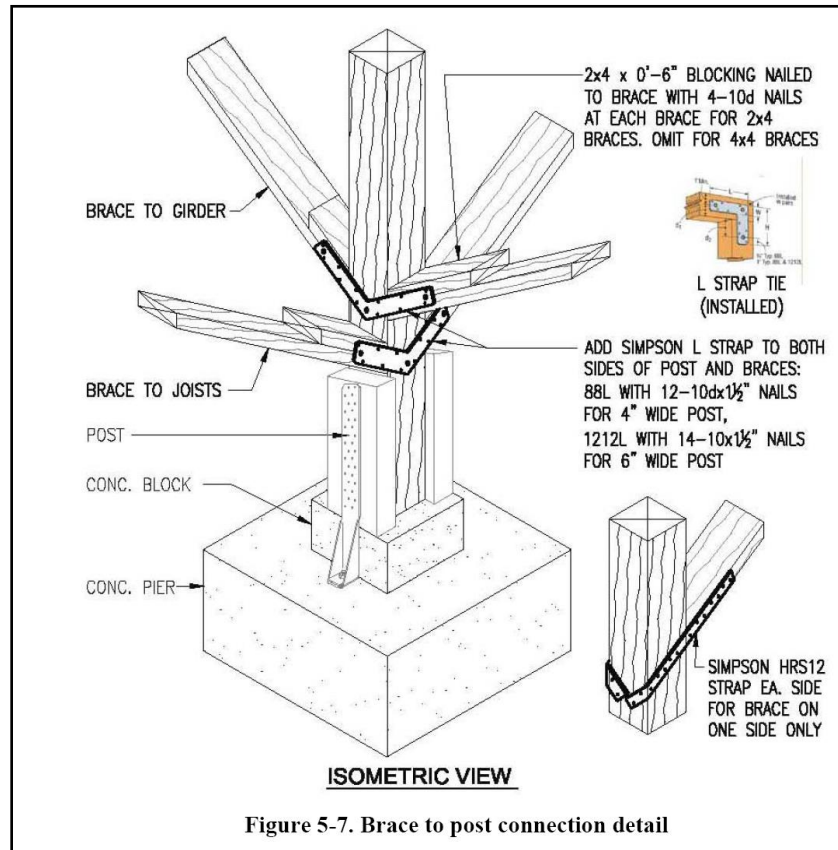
Diagonal brace to post connection detail from Retrofit Report.
